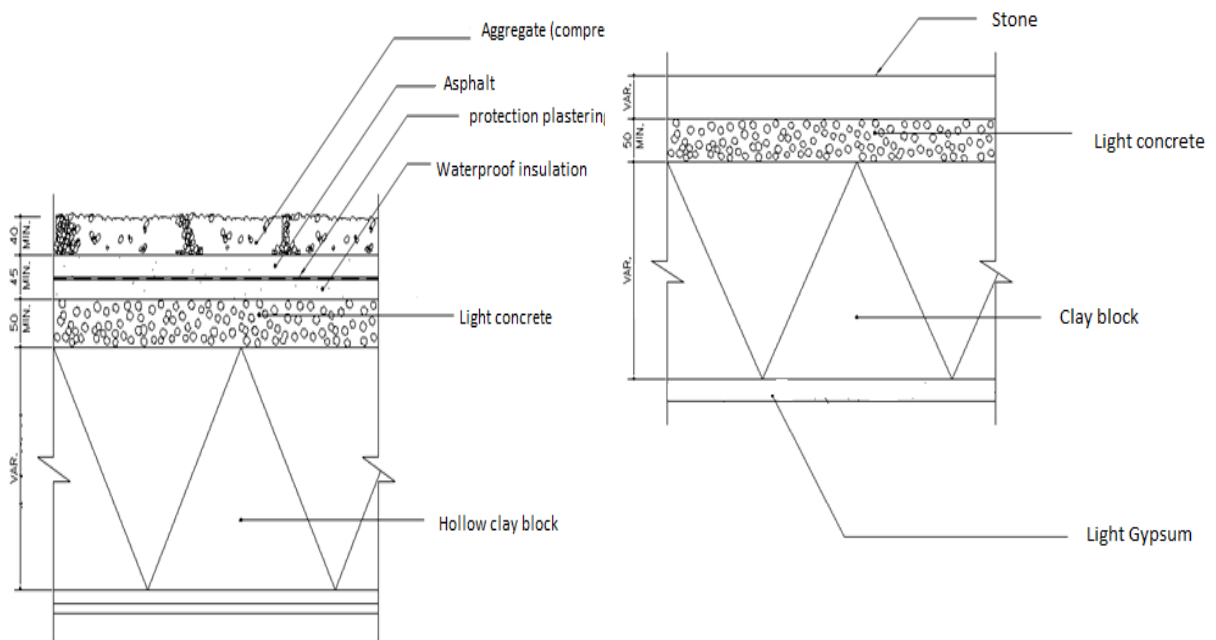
Base Case Roof Details (Left) and Floor Details (Right)
